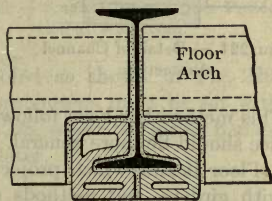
Detail of Beam Protection with Shoe Tiles.
